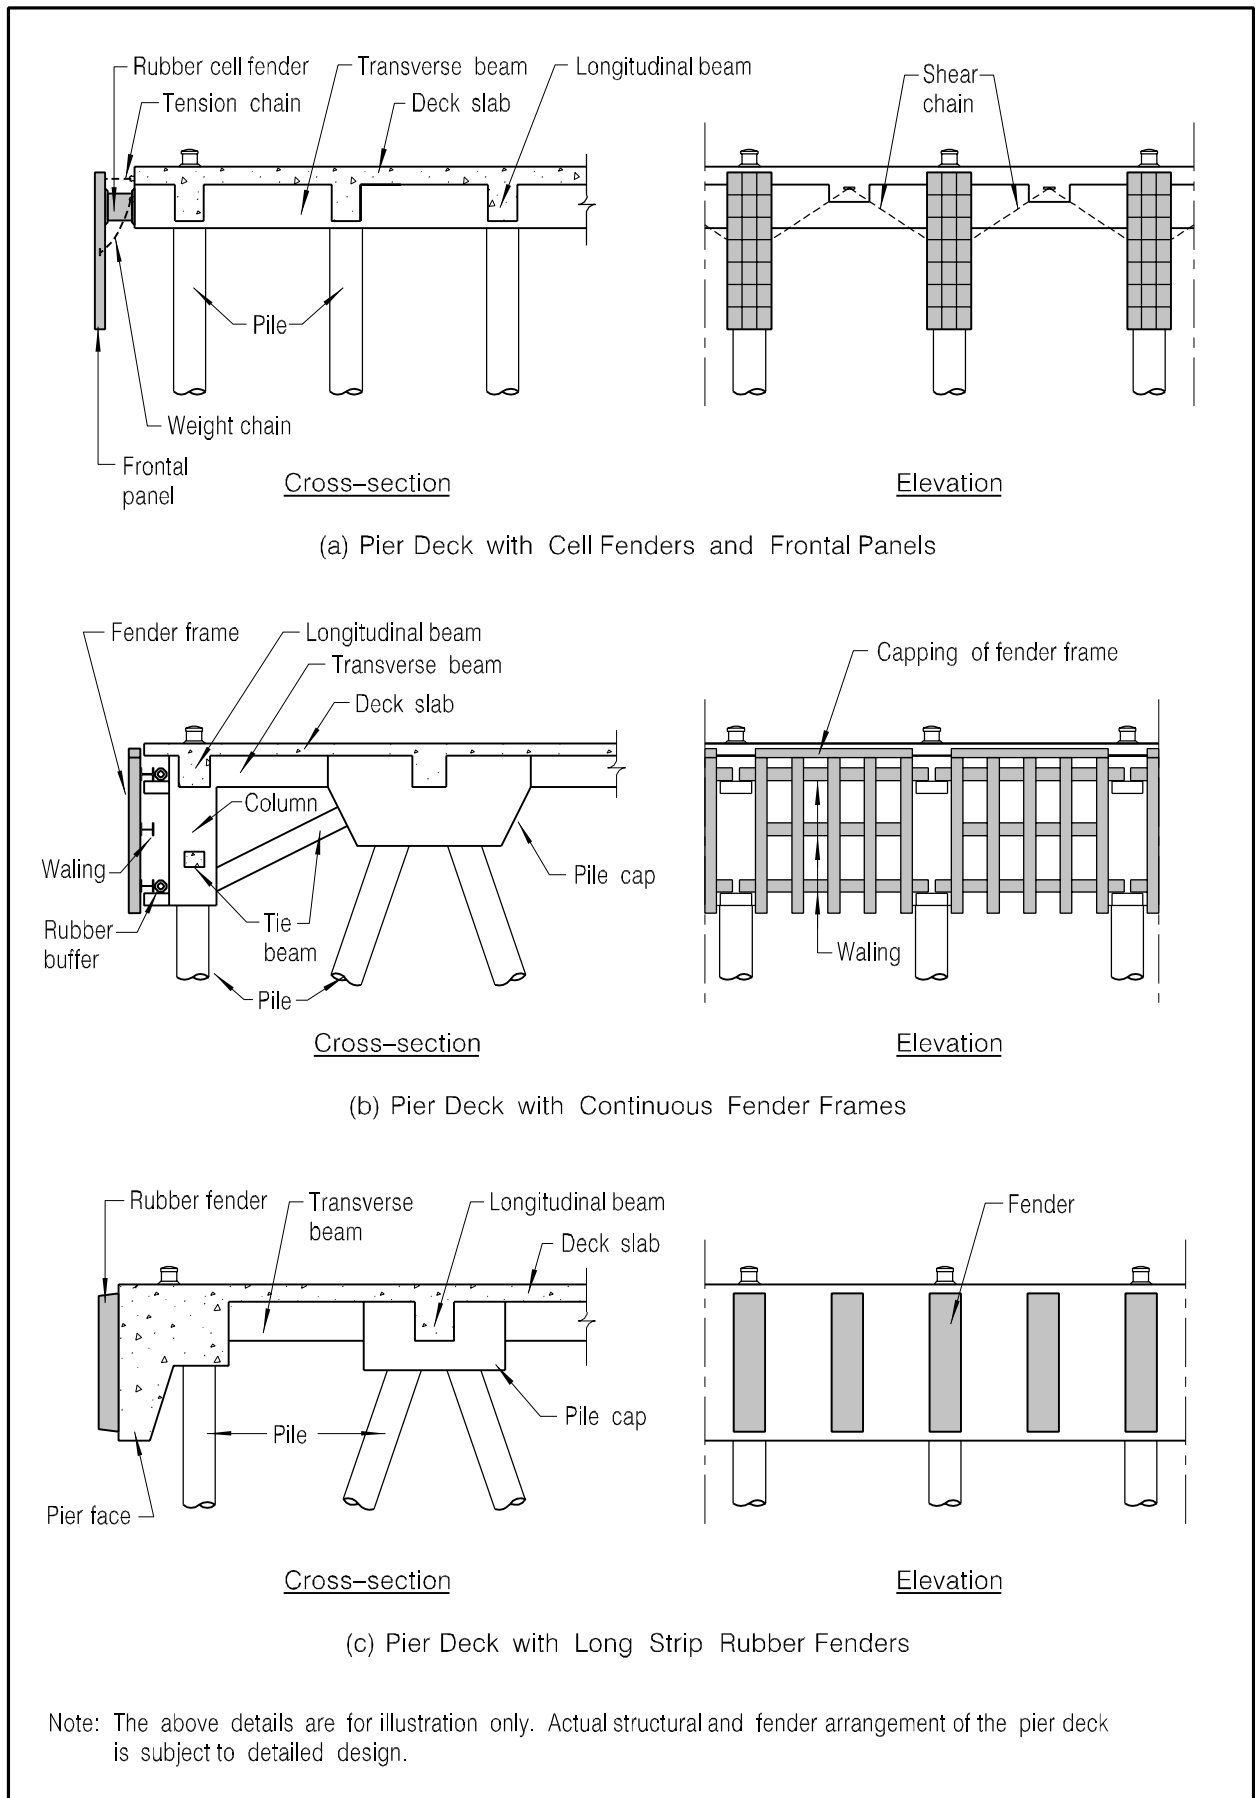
Cross-section of Reinforced Concrete Piled Deck Pier
